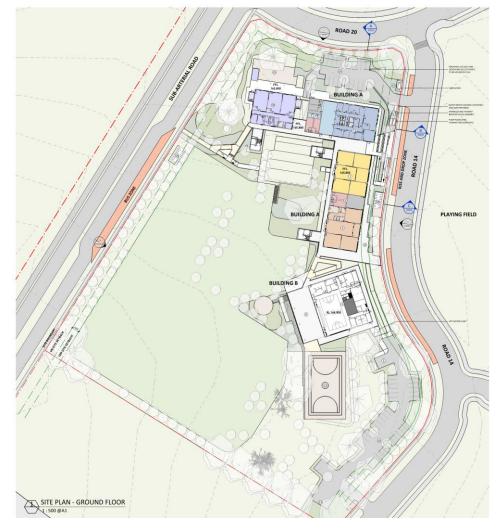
Proposed Site Plan. Source: PTW, 2024.
